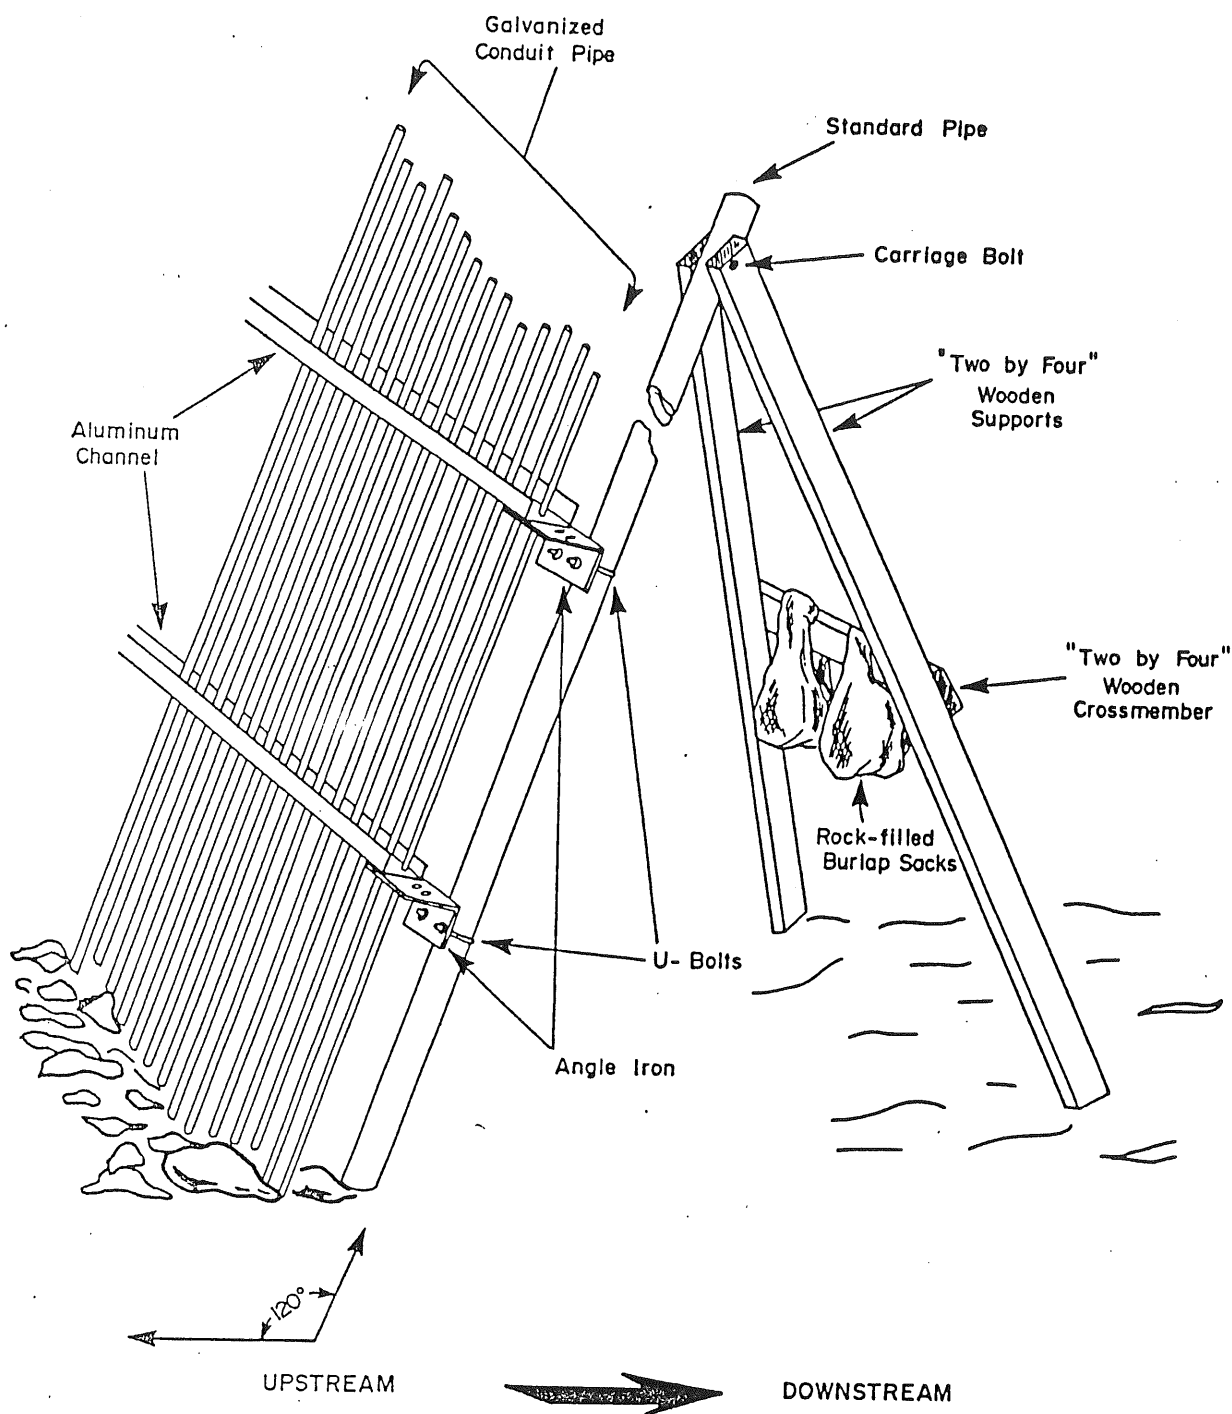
Construction details of wings of conduit pipe weirs. (From Kristofferson et al. 1986)
